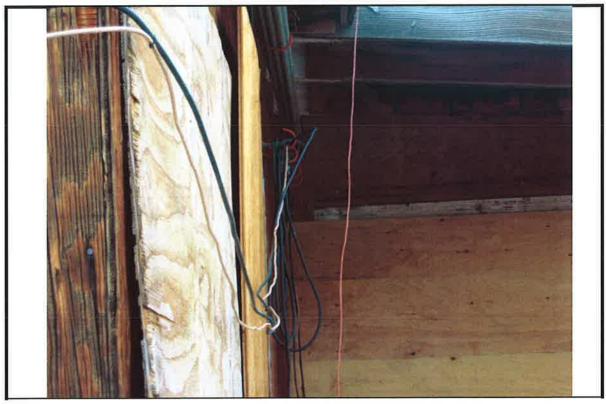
DATE: TAKEN BY: #_NOTES: ELECTRCAL WIRES HANGING FROM CEILING N.O.D. #6
